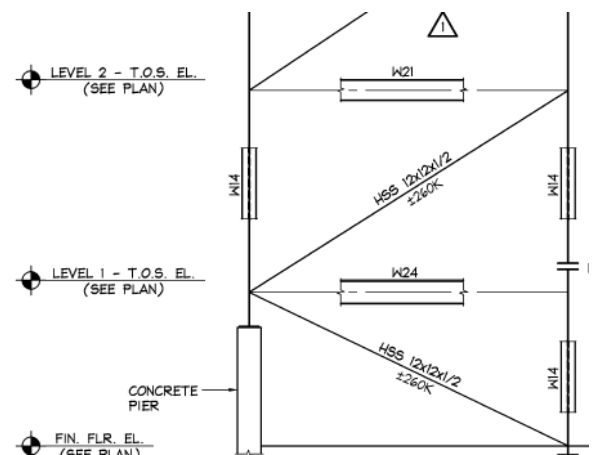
TYPICAL BRACED FRAME COURTESY OF TURNER CONSTRUCTION
